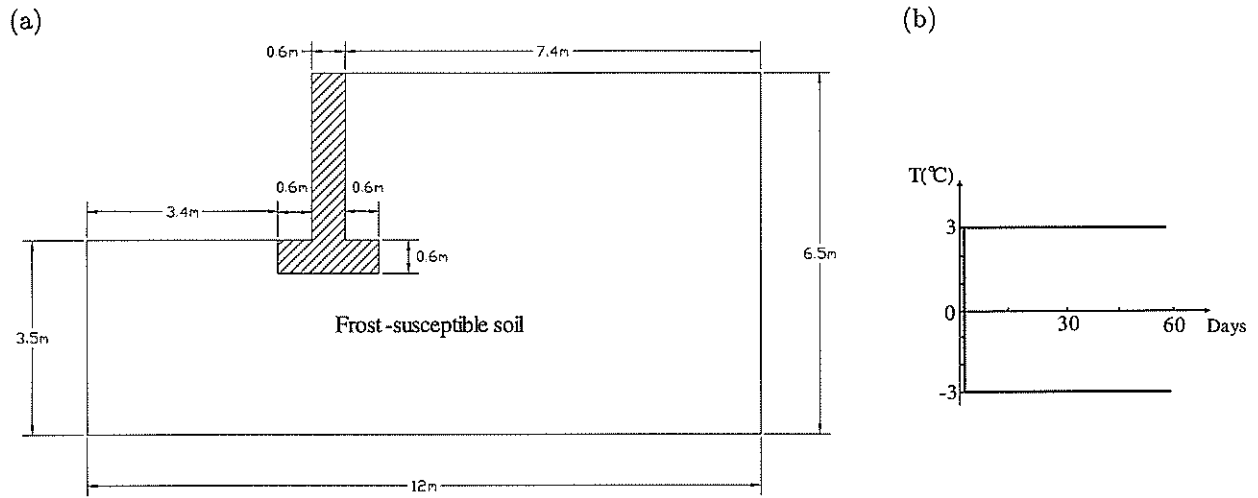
Retaining wall: (a) geometry, and (b) thermal initial and boundary conditions
